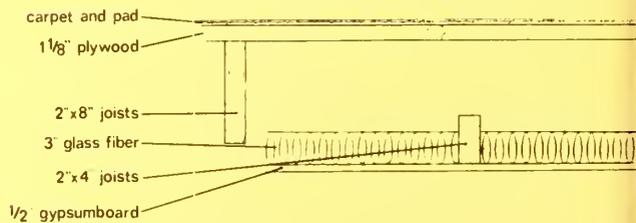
Floor-ceiling assemblies with separate floor and ceiling joists.
